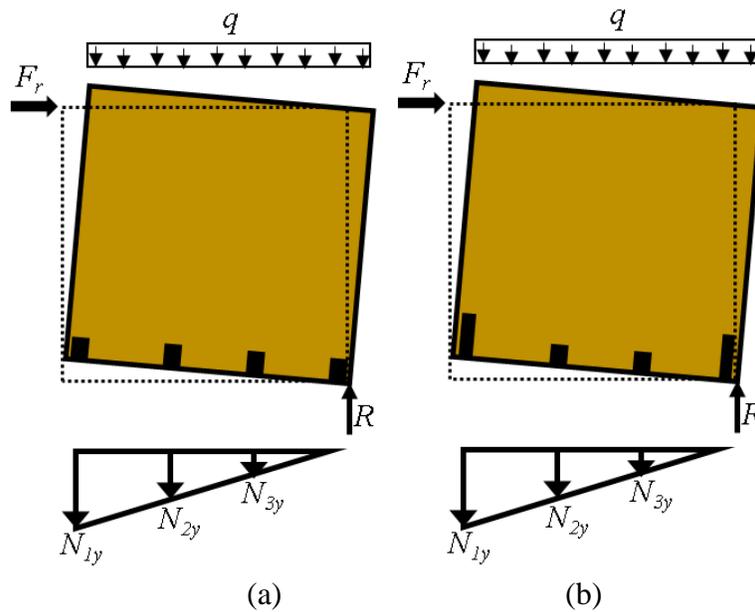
Rocking of CLT walls: (a) with brackets only and (b) with brackets and HDs
